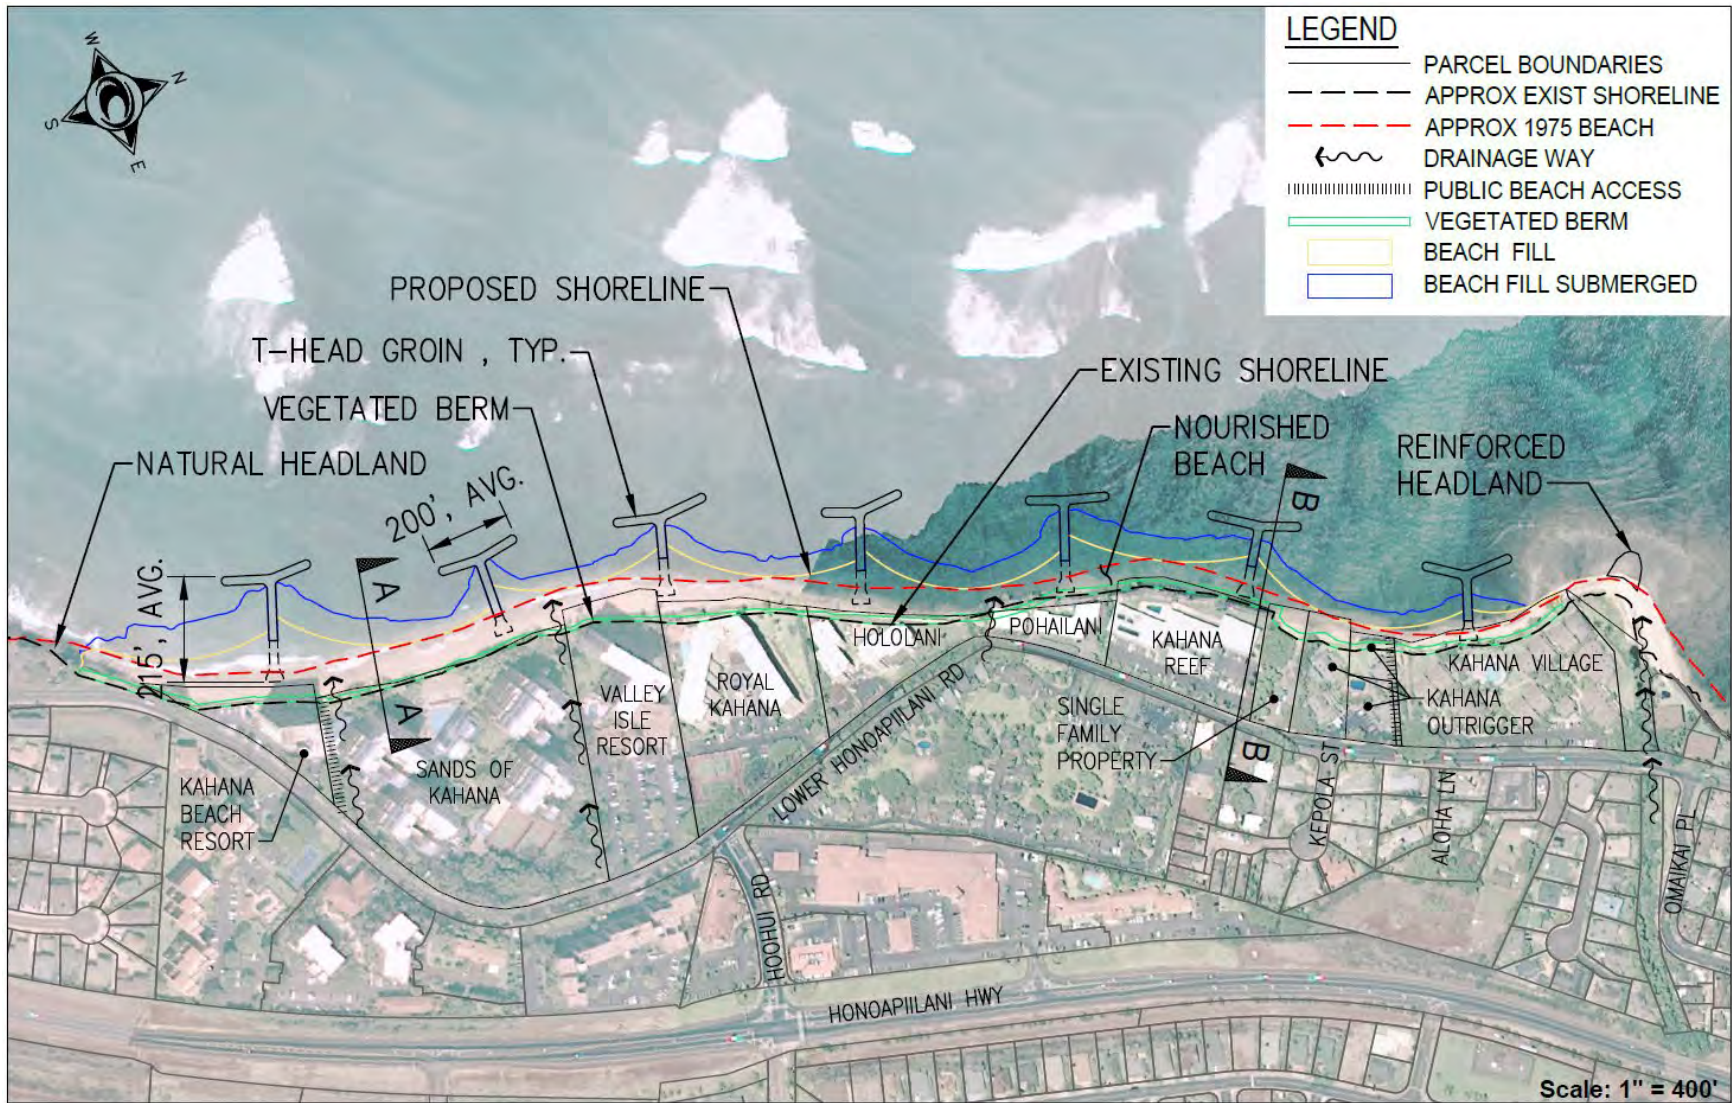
Proposed Action: Beach Nourishment with Stabilizing Structures
